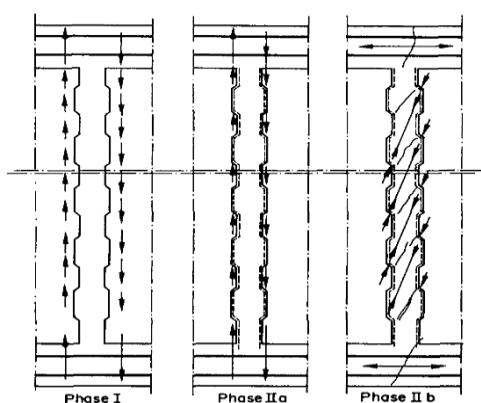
Progressive failure of a shear key connection between adjacent prefabricated RC wall panels [30]
